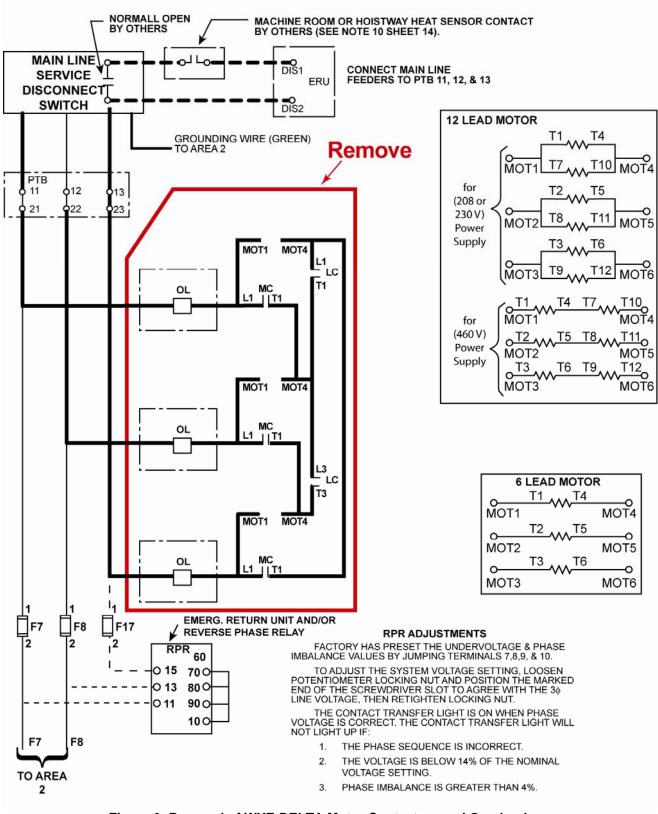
Removal of WYE-DELTA Motor Contactors and Overload
